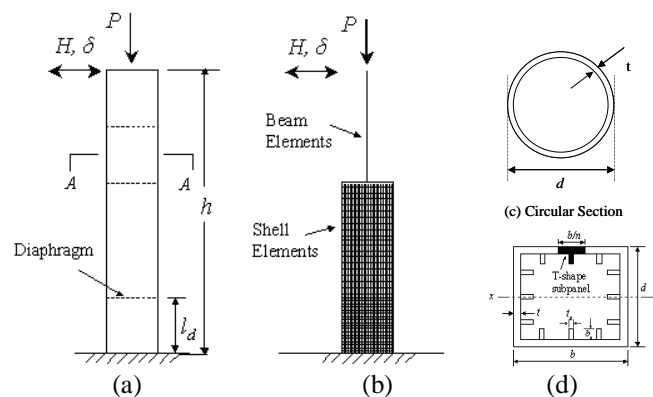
Modeling of Steel Tubular Columns: (a) Steel Tubular Column, (b) Analytical Model, (c) Circular Section, (d) Stiffened Rectangular Section
